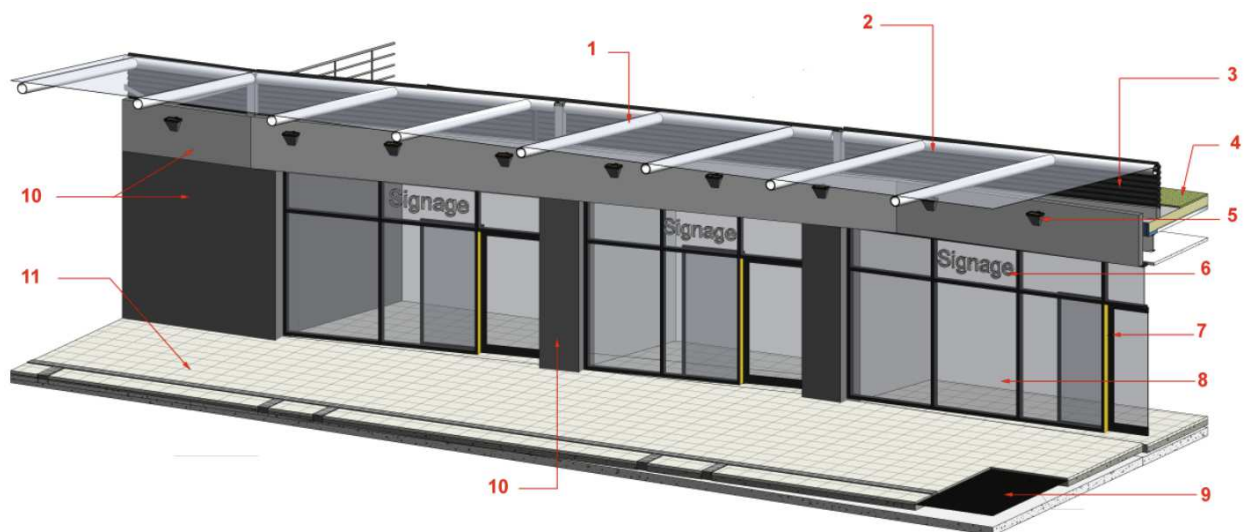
Mall, Mall Roof and Retail Unit Frontages Design
